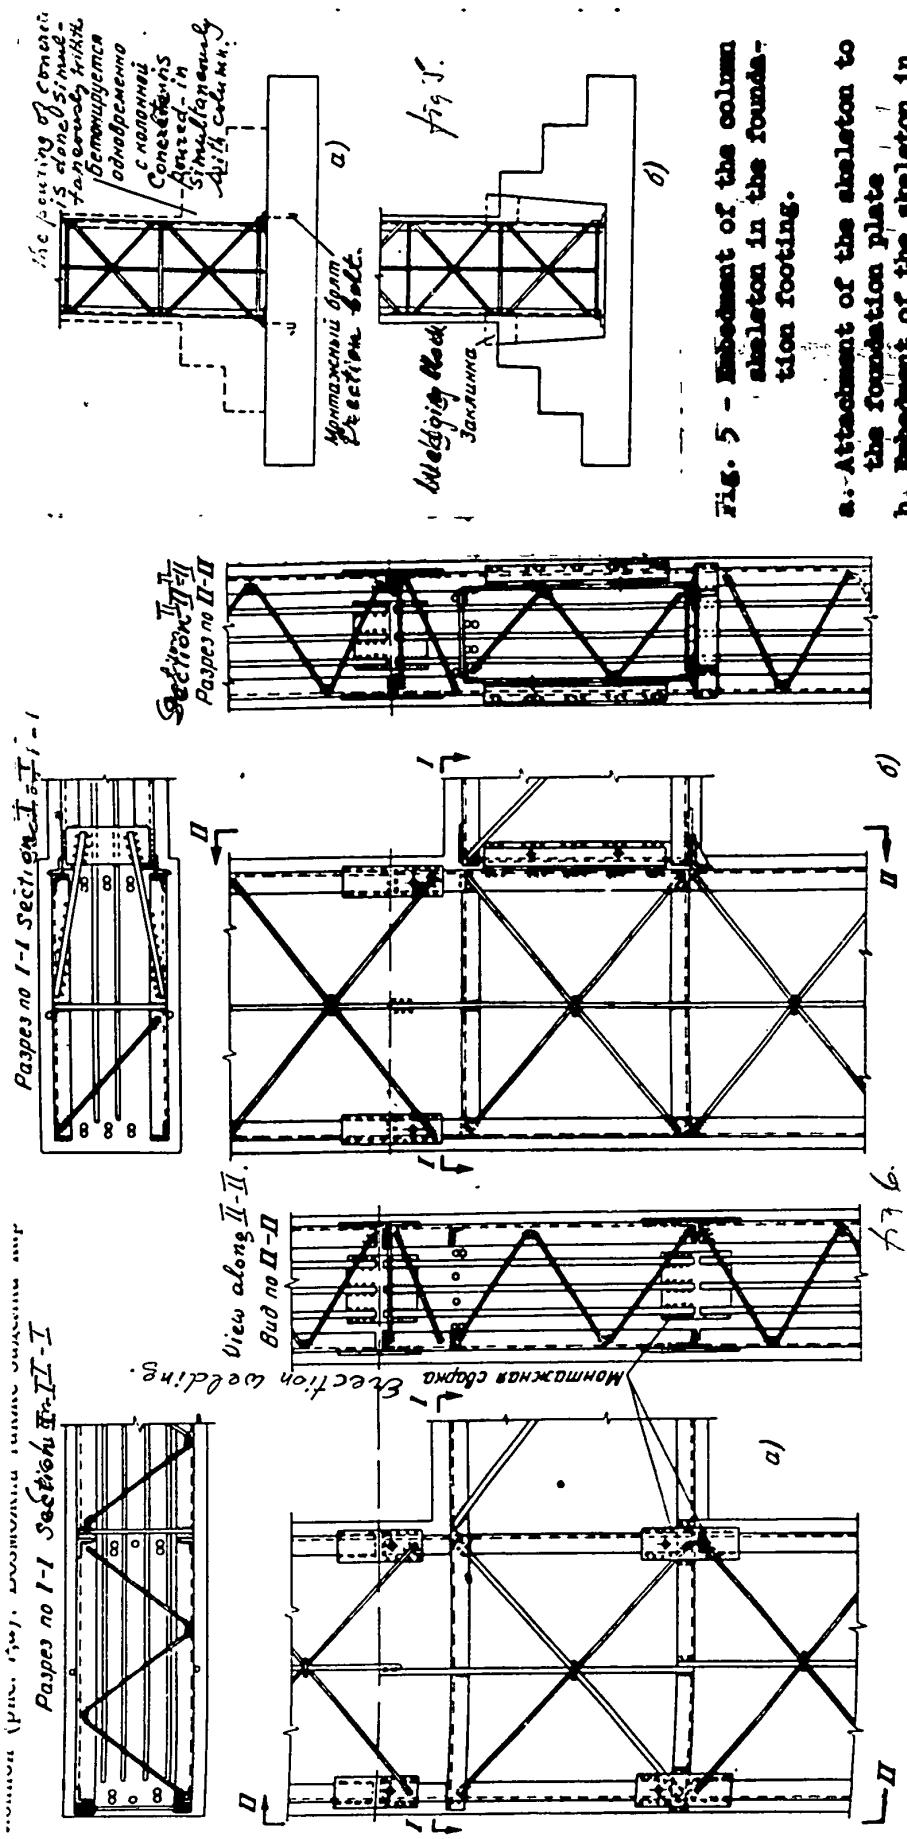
Embedment of the column skeleton in the foundation footing.
